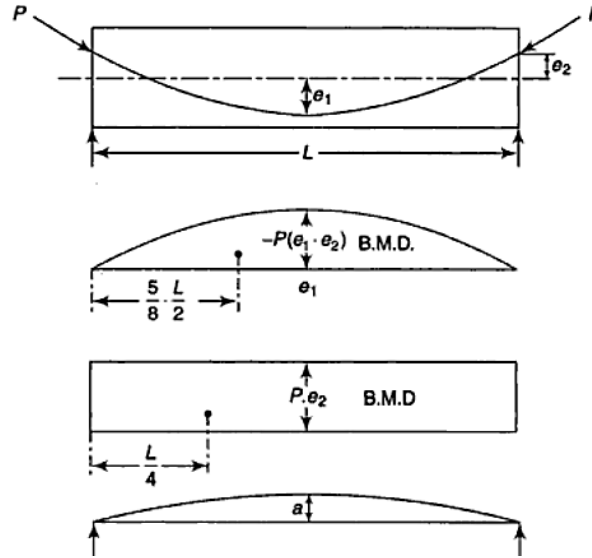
camber of girder beam under eccentric parabolic tendon (eccentric anchor)
